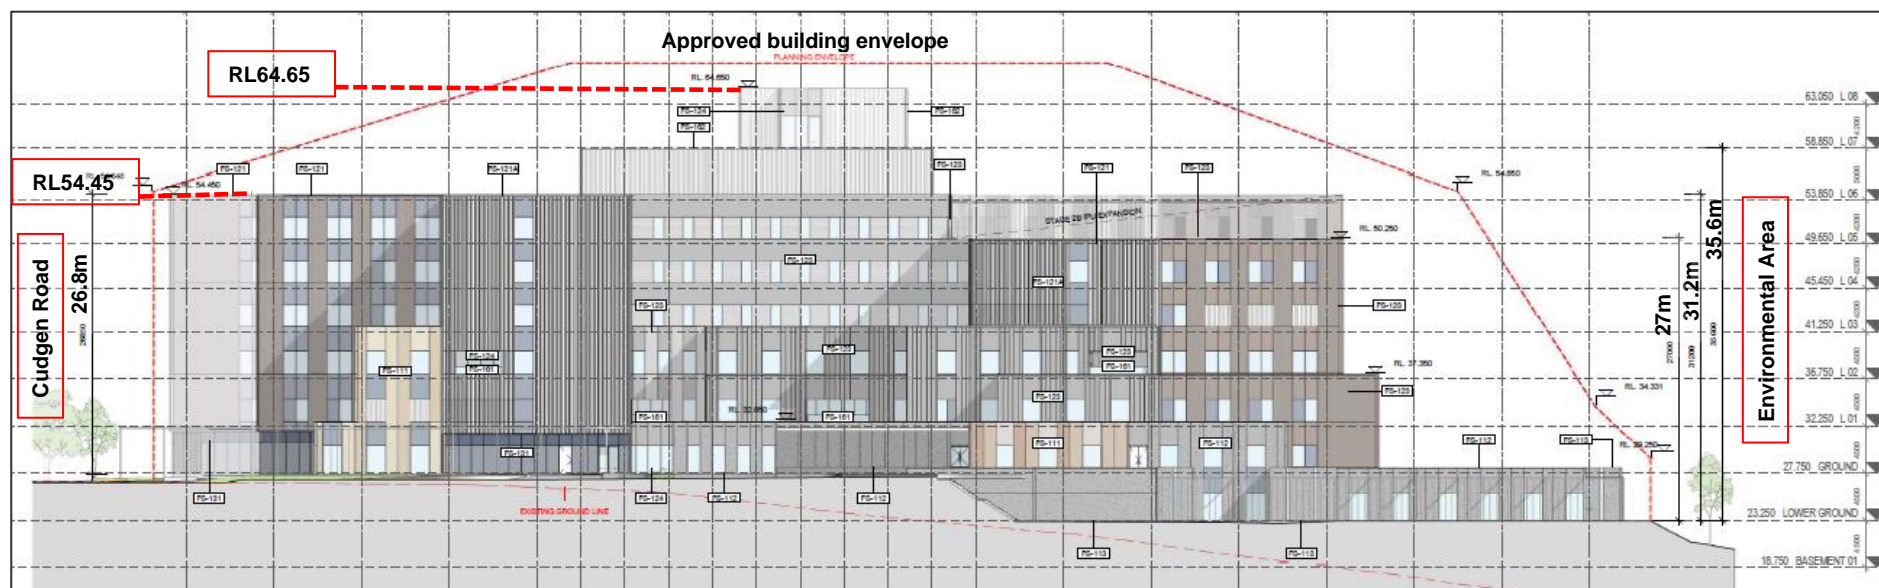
| New hospital building elevation fronting Cudgen Road (south) (Source: Applicant's RTS)
